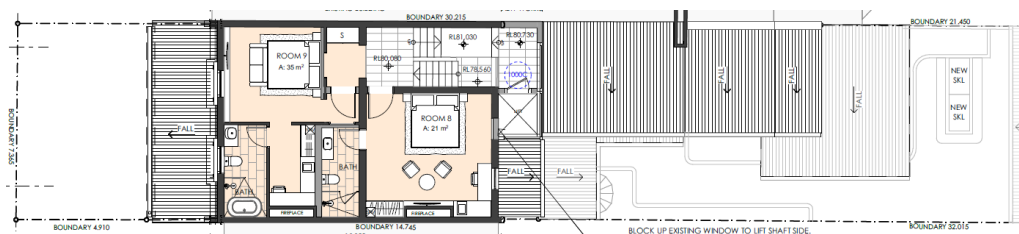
Proposed ground floor east plan – 40 The Avenue, Randwick (Source: PTI Architecture)
